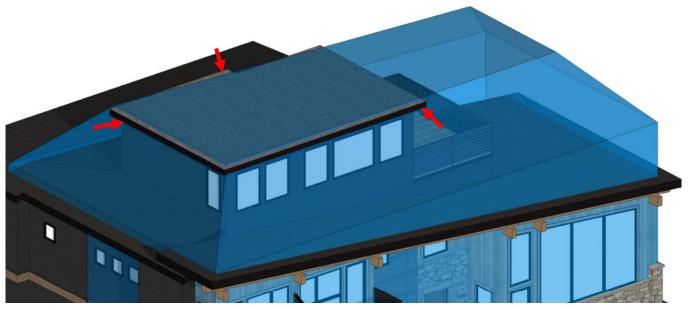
Front angle of the eaves projecting beyond the Building Envelope.
